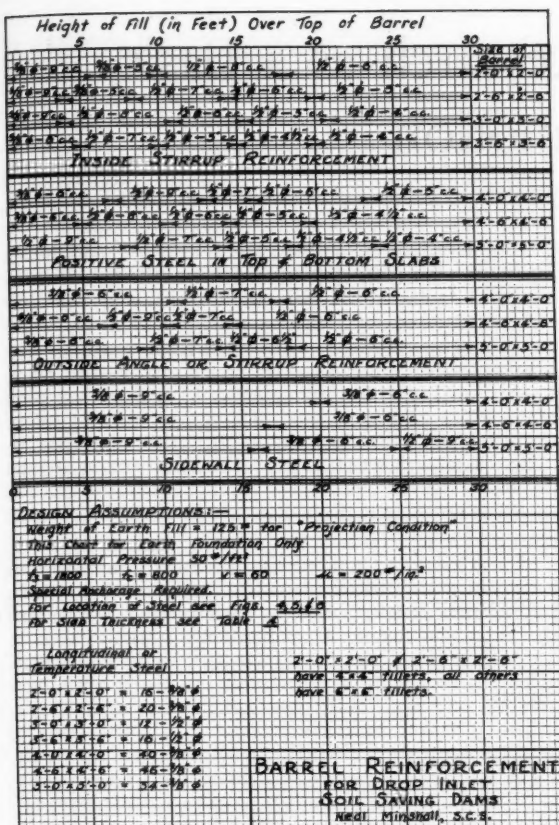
REINFORCEMENT FOR DROP-INLET BARRELS
